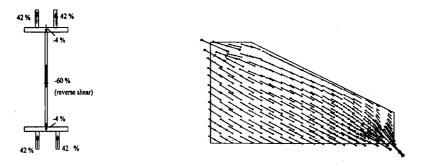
Shear Transfer at the Column Face (specimen COH-1)
